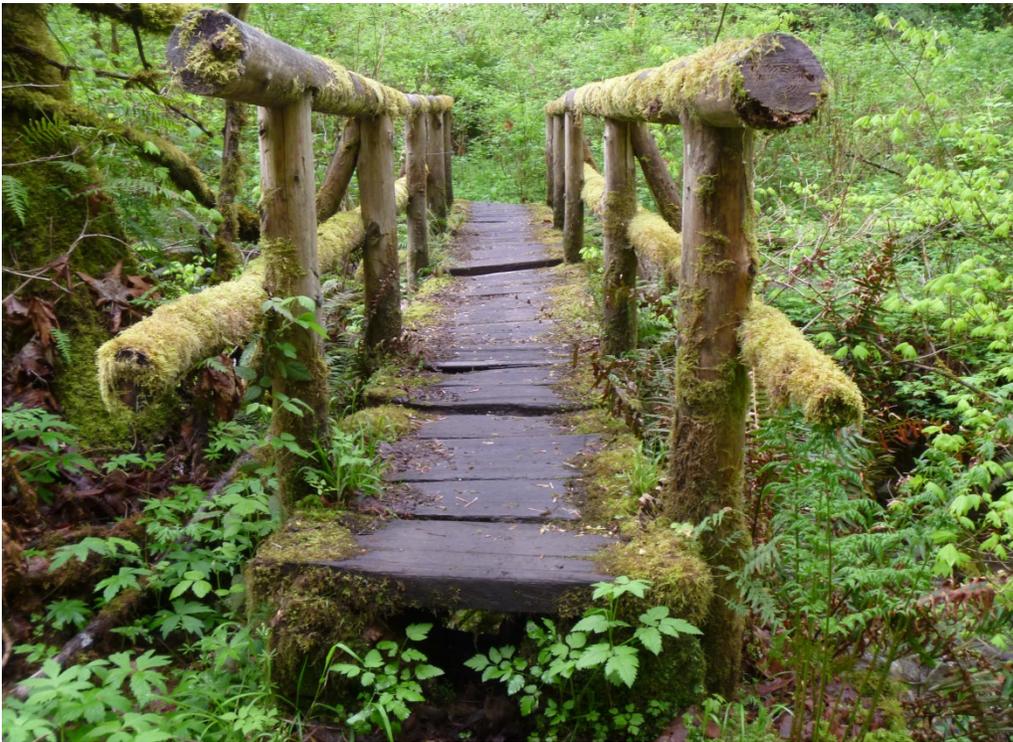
Bridge at Site 1, photo taken from the right bank (looking downstream) of Coal Creek.
